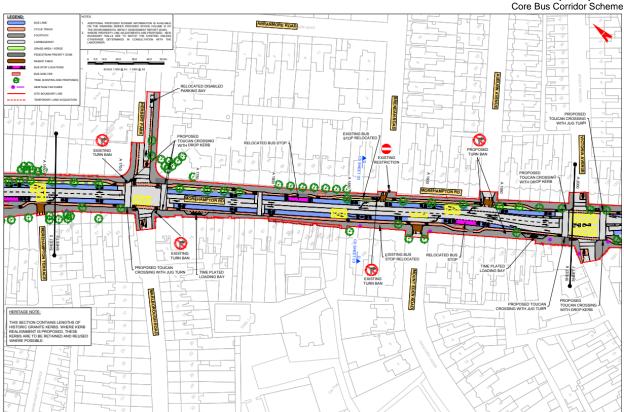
Extract from General Arrangement Drawings along R138 Morehampton Road (Sheet 09)
